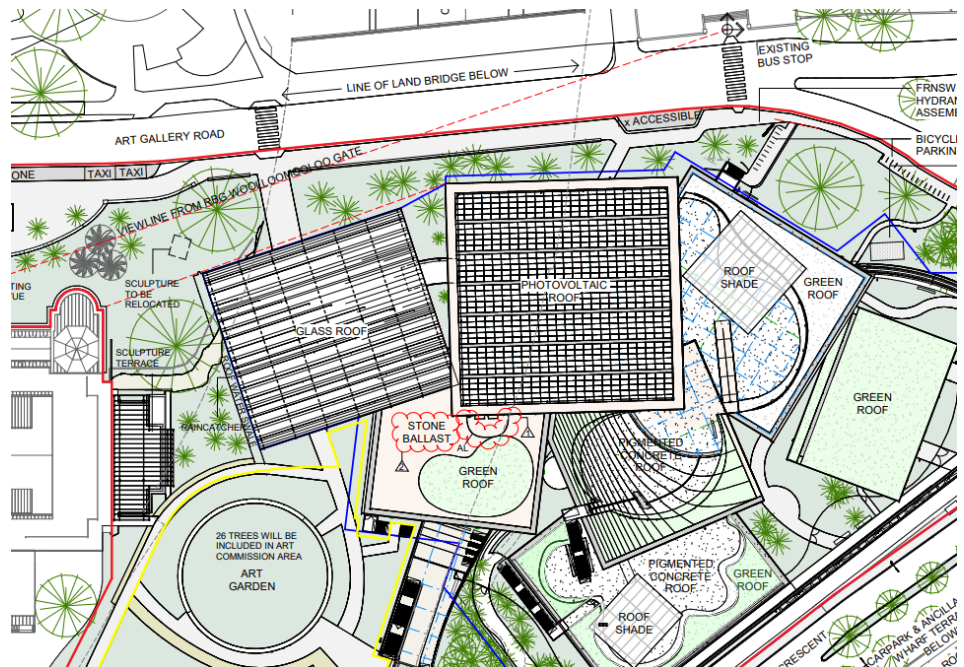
Proposed Site Plan – Drawing no. DA_1001
